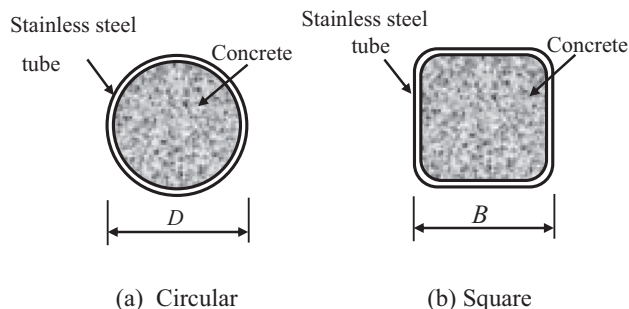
Typical cross-sections of concrete filled stainless steel tubes.
